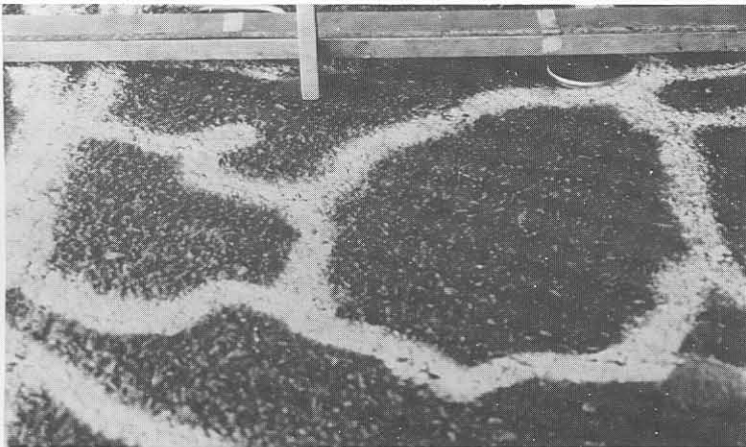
RELATIVELY SHALLOW PAVEMENT: ROAD 2212 – EXCESSIVE FATIGUE AND CRUSHING FAILURE AT THE END OF THE TEST (41 803 REPETITIONS) ON HVS TEST SECTION 309A4, MEASURING POINT 5 (TRAFFICKING SINGLE WHEEL LOAD: 150 kN; TYRE PRESSURE: 1445 kPa).
